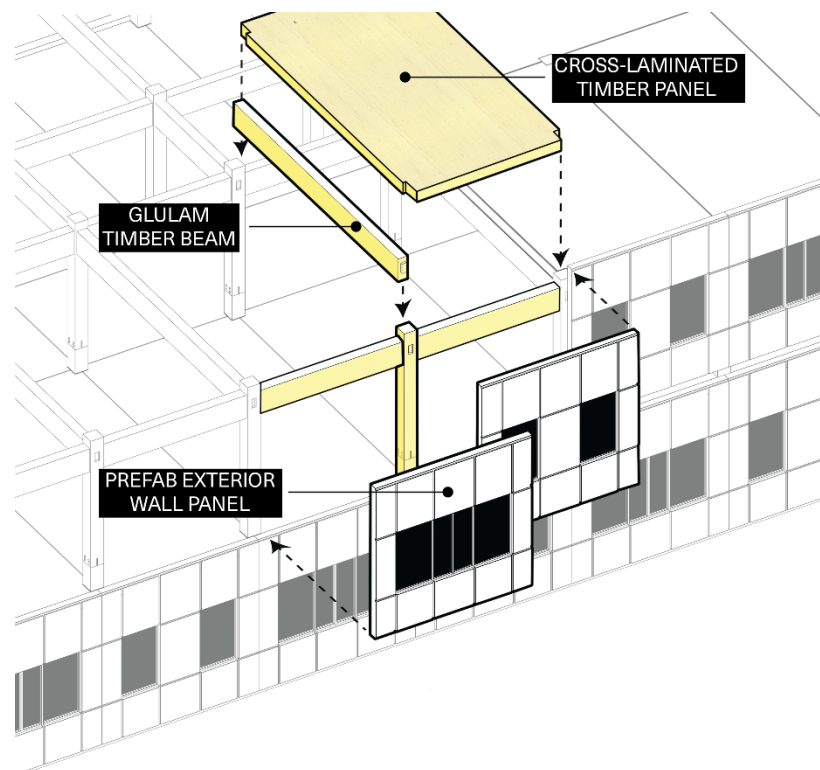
Graphic illustrating the process of construction of the mass timber structure and a typical exterior wall panel.
